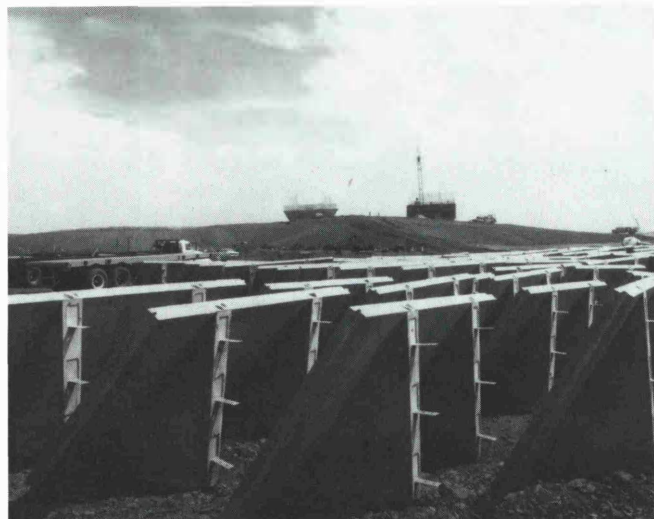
Panels used as facing for Reinforced Earth structures are modified double-T section precast of 4000 lb/in² concrete
